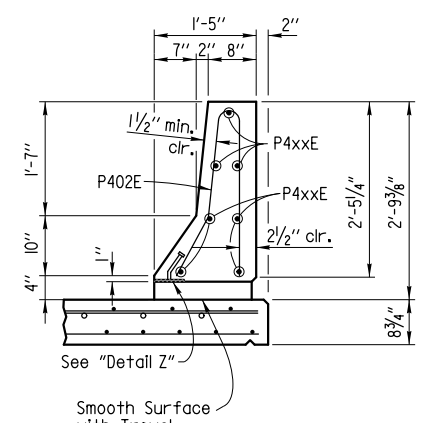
DETAILS OF OPTIONAL SLIPFORMING OF CONCRETE PARAPET RAIL
